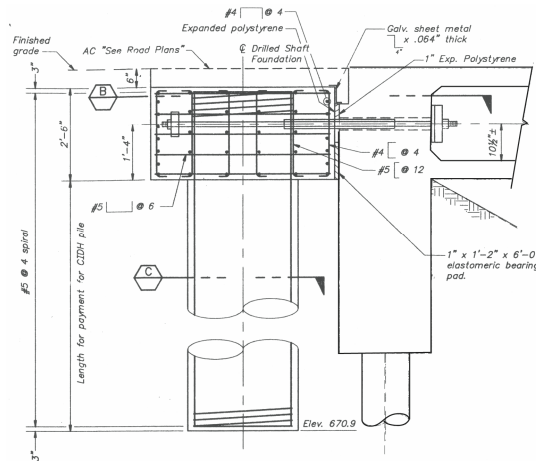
Typical Abutment Retrofit Detail (PB, 1993).
